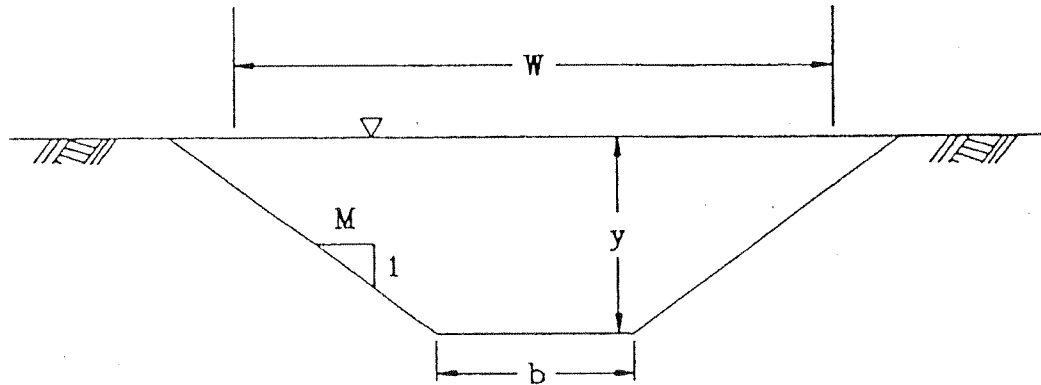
Trapezoidal Channel - Definition of Variables
